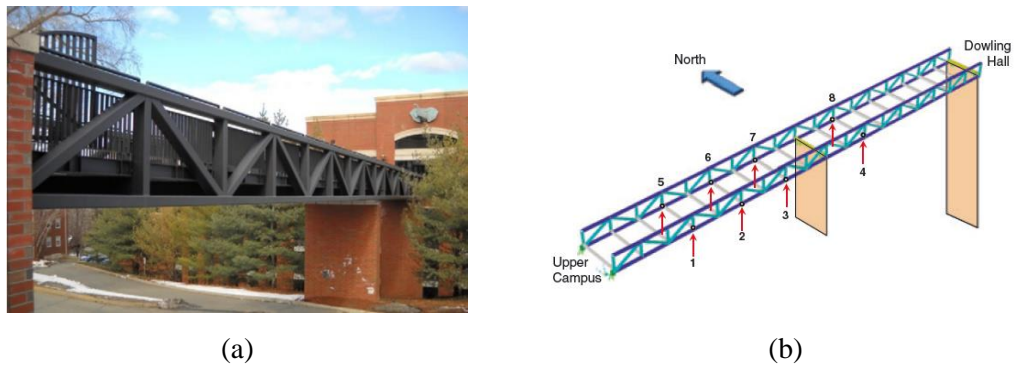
(a) South view of Dowling Hall Footbridge; (b) Sensor layout.
